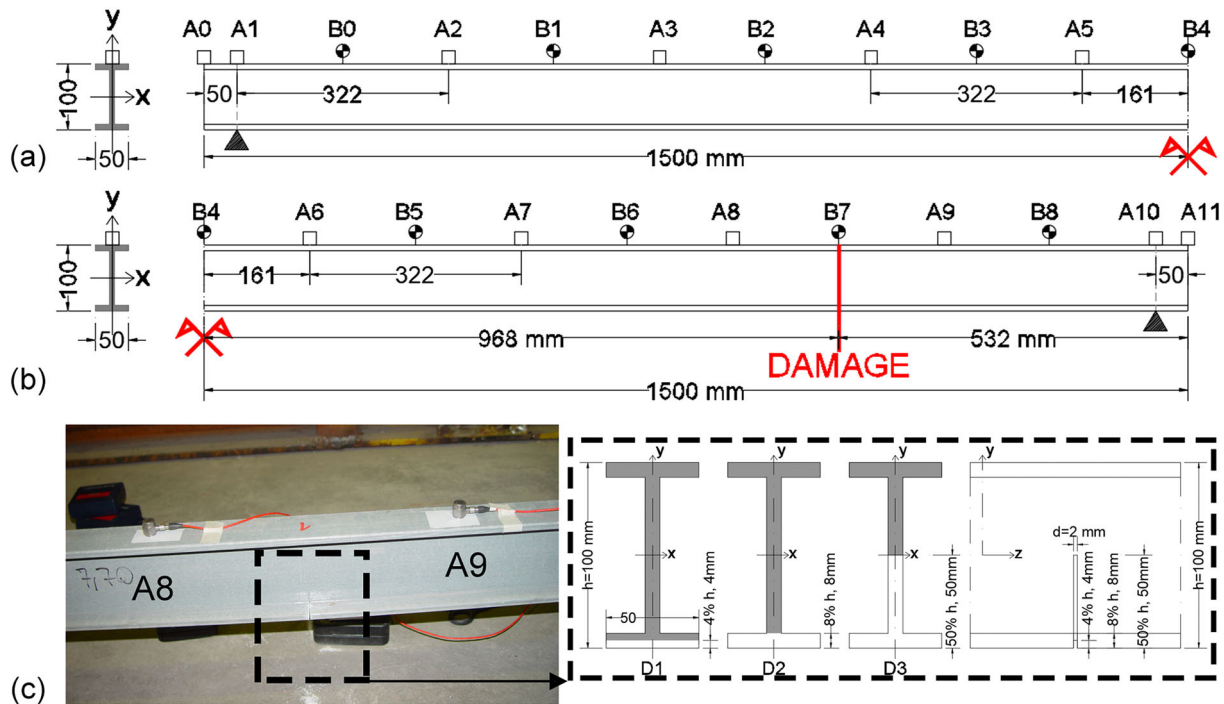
Undamaged half-beam and sensor layout (a), damaged half-beam and sensor layout (b), and damage details (c)
